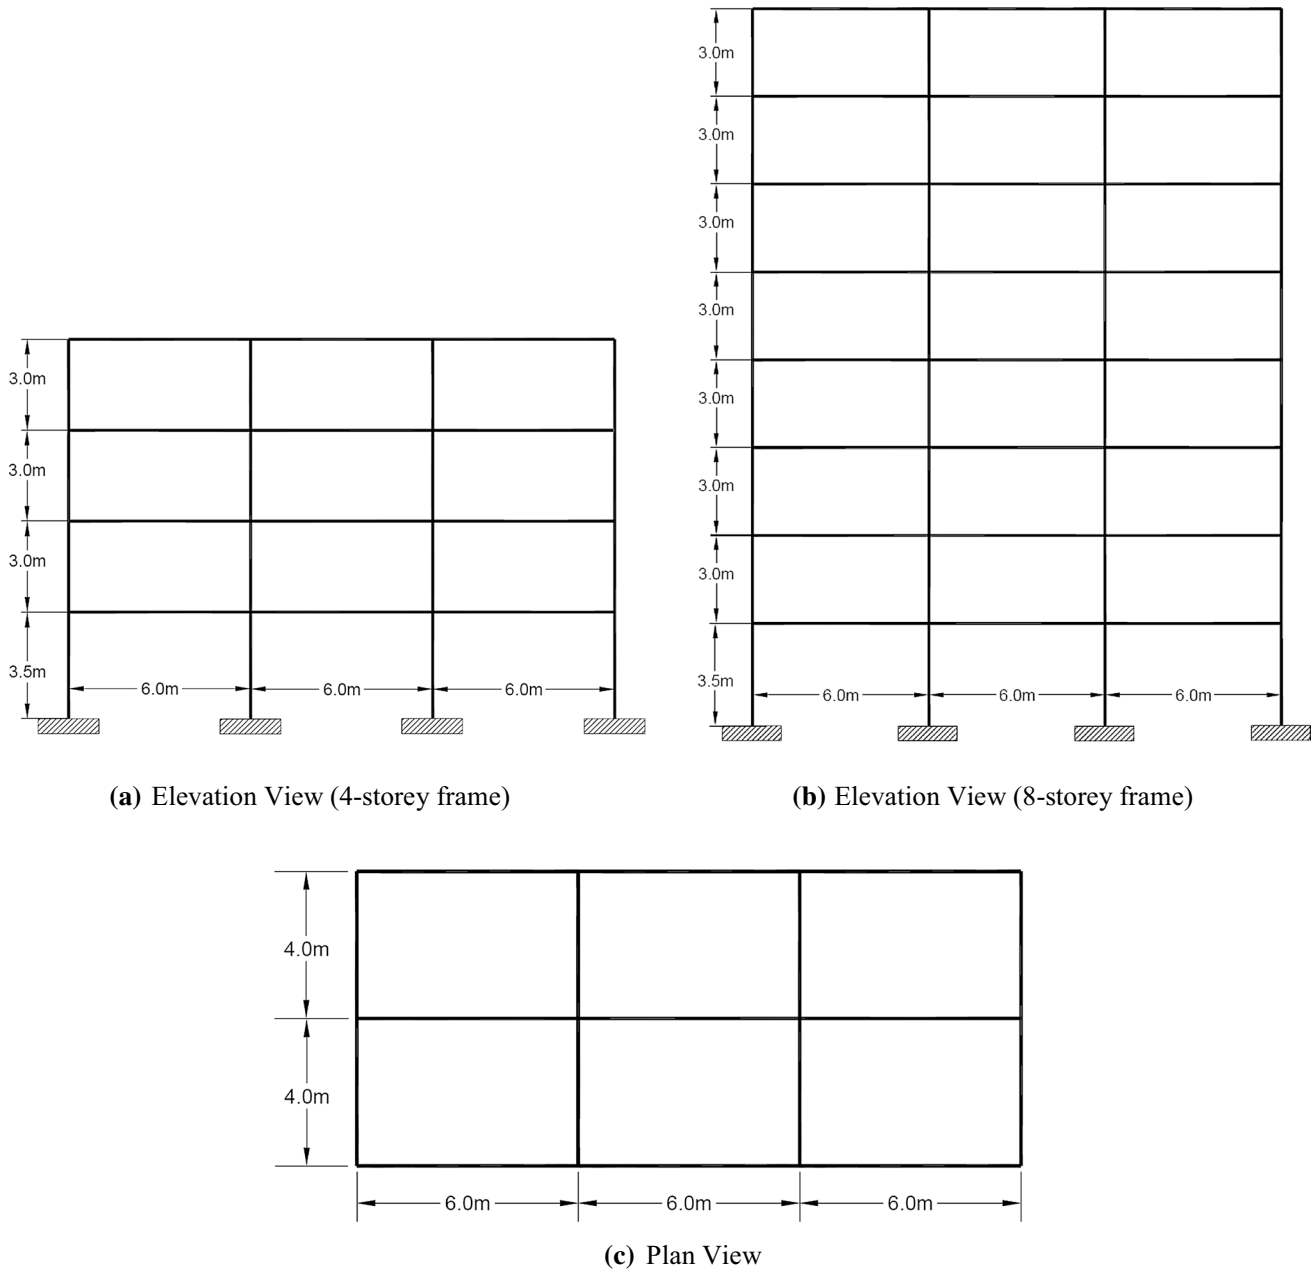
The plan and elevation of 4-storey and 8-storey RC building frames
